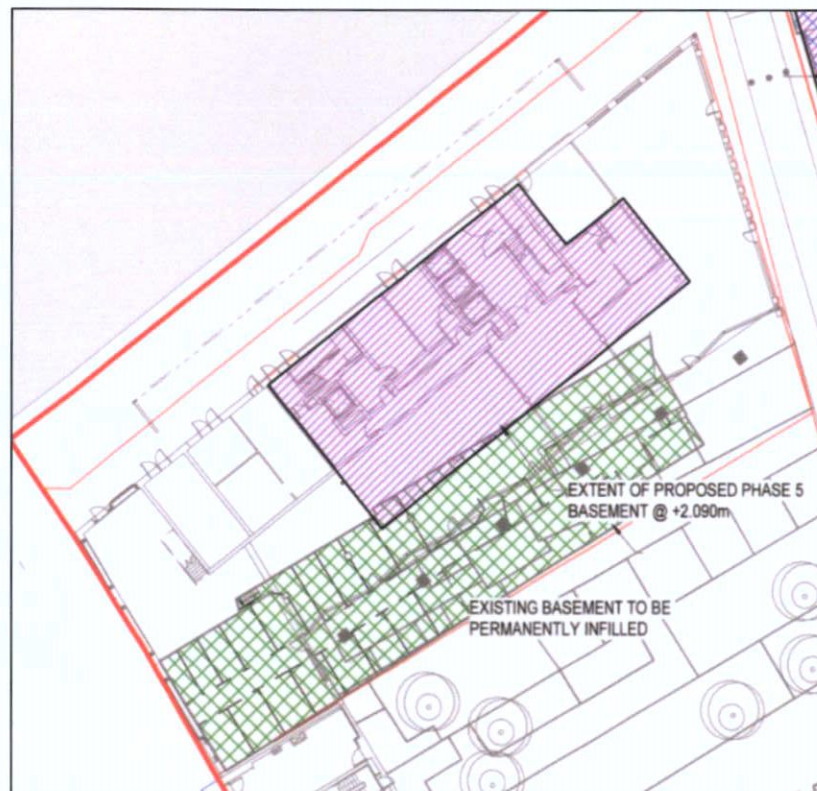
Existing basement beneath No. 22 and 23 Moore Street backfilled permanently (green) and proposed basement (pink) in Site 5.
